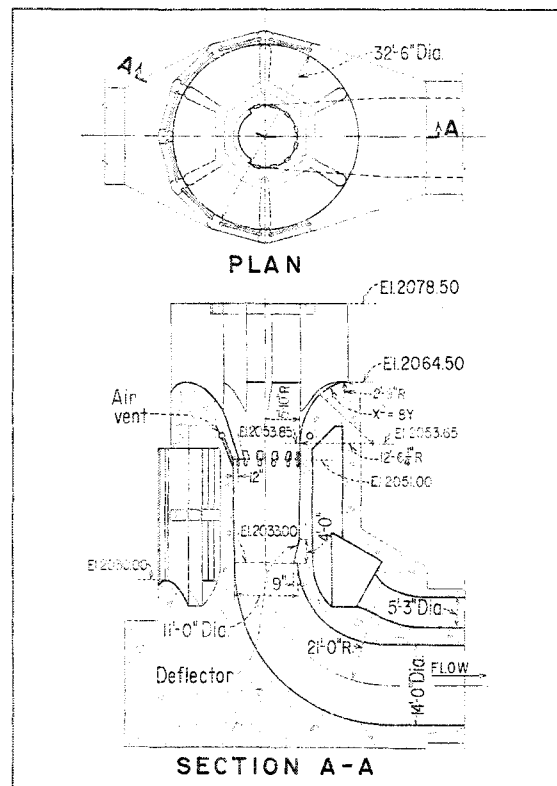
Entrance details of the spillway and outlet works at Heart Butte Dam.
